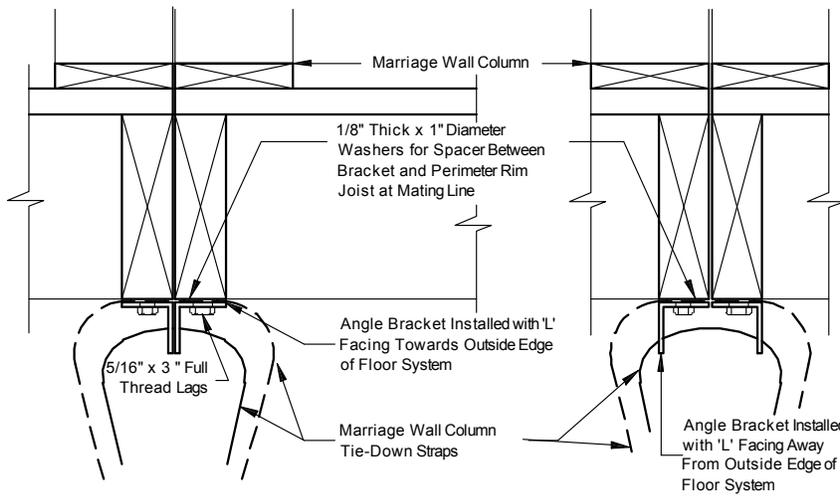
Marriage line tie-down connections using steel angles. Strap may run between steel angle and rim joist (shown as dashed line)
